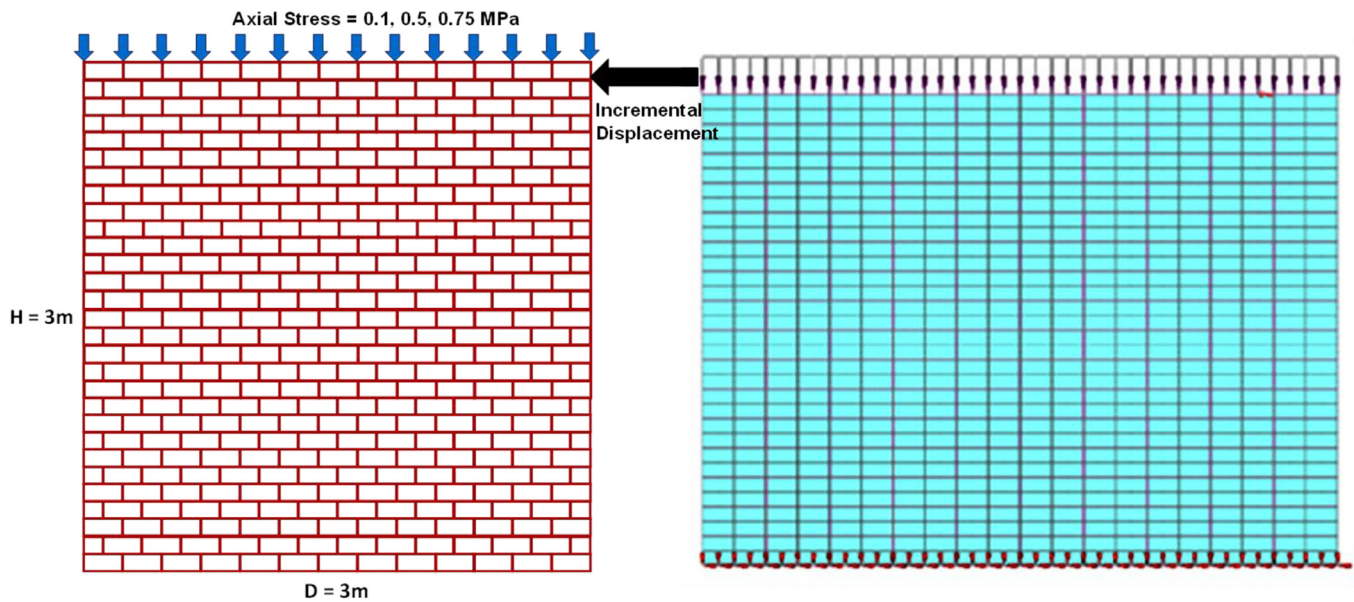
(a) Pier details; (b) pier mesh in DIANA®.
